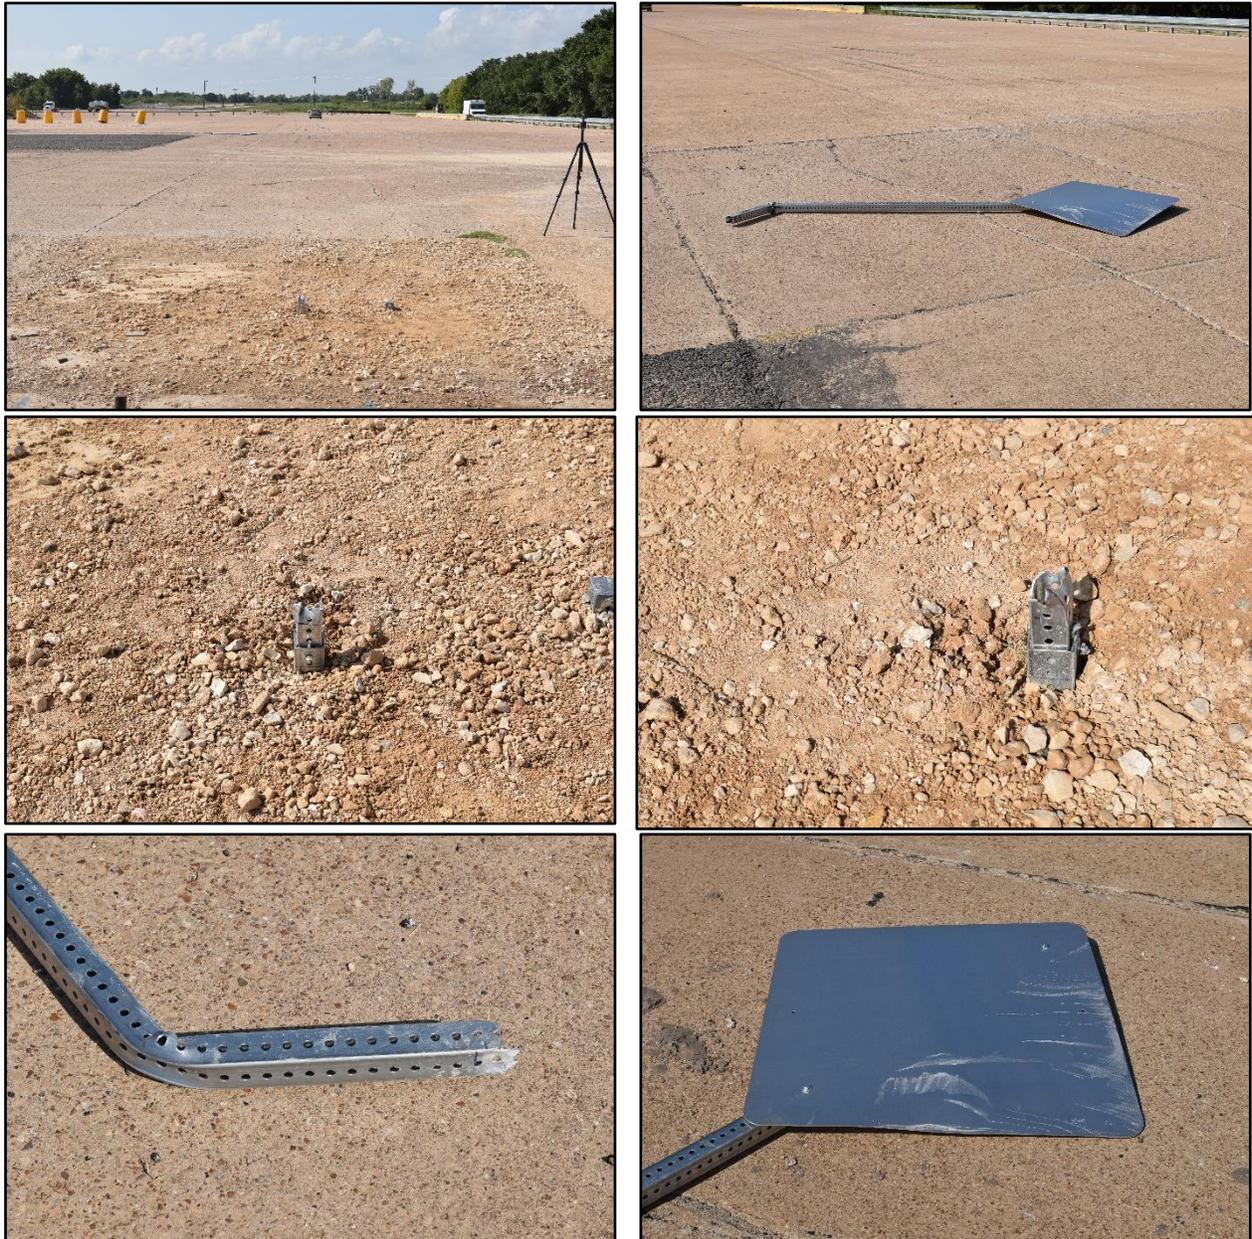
PSST Sign Support in Anchor Stub System after Test No. 469469-07-05.
